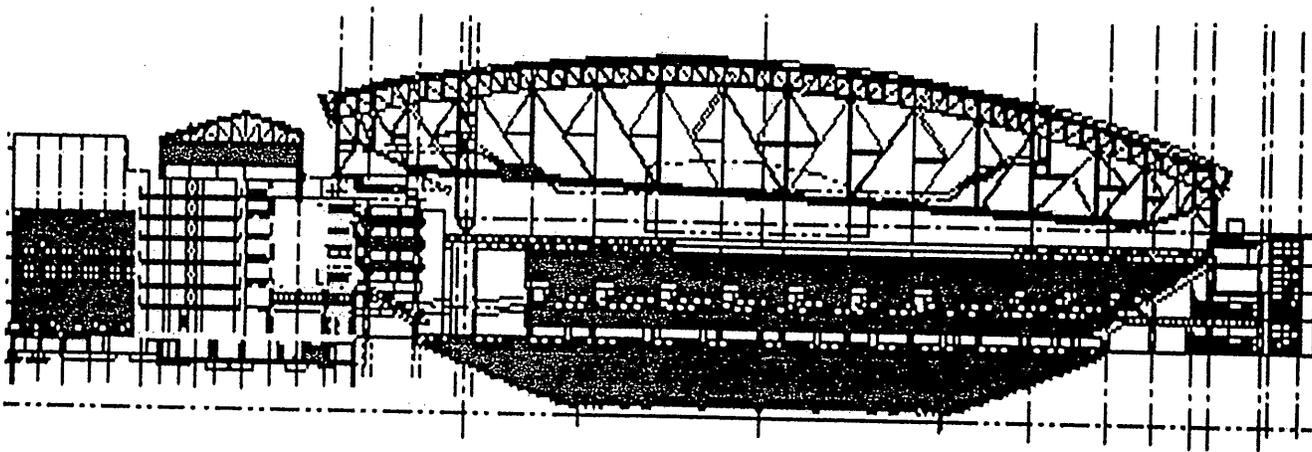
Section through Stadium and adjacent 9-story warehouse building looking West
